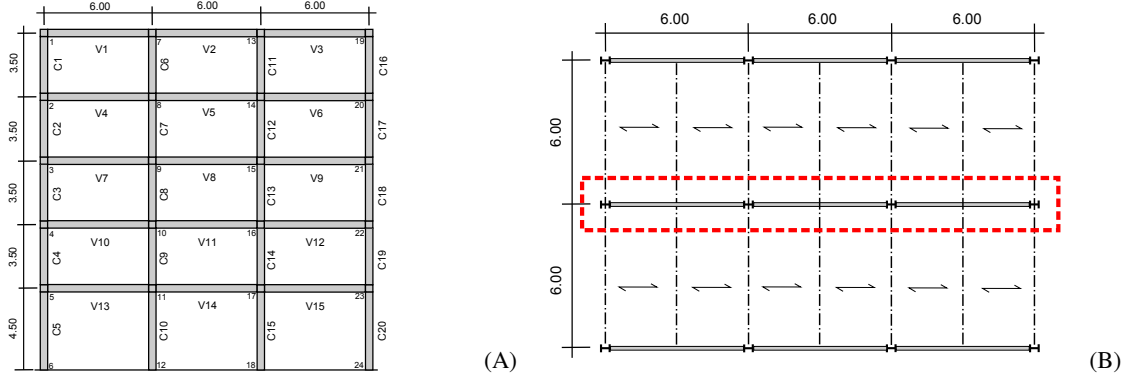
Frame dimensions, elements and node numbering: (A) elevation view; (B) and plan view
